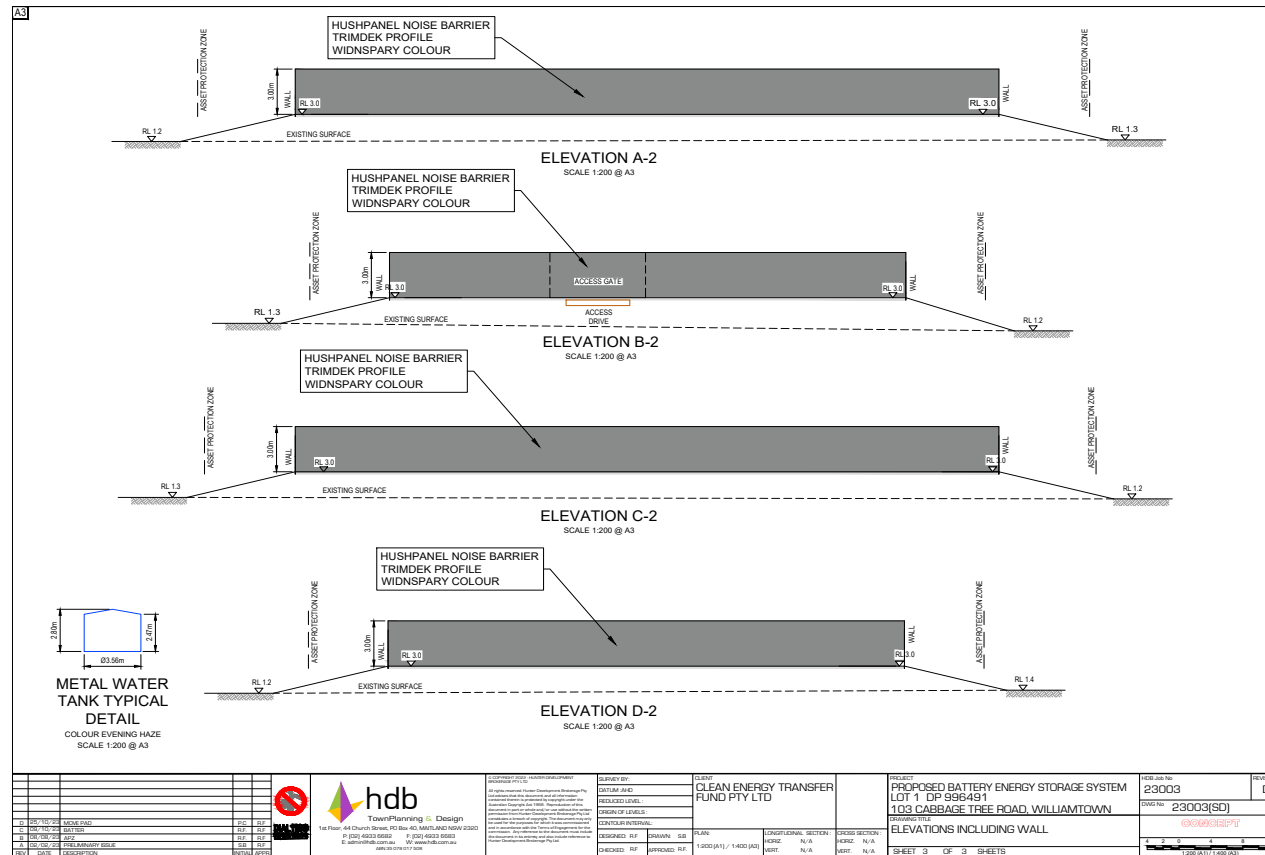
Site Elevations including Wall (source: HDB, 2023)
